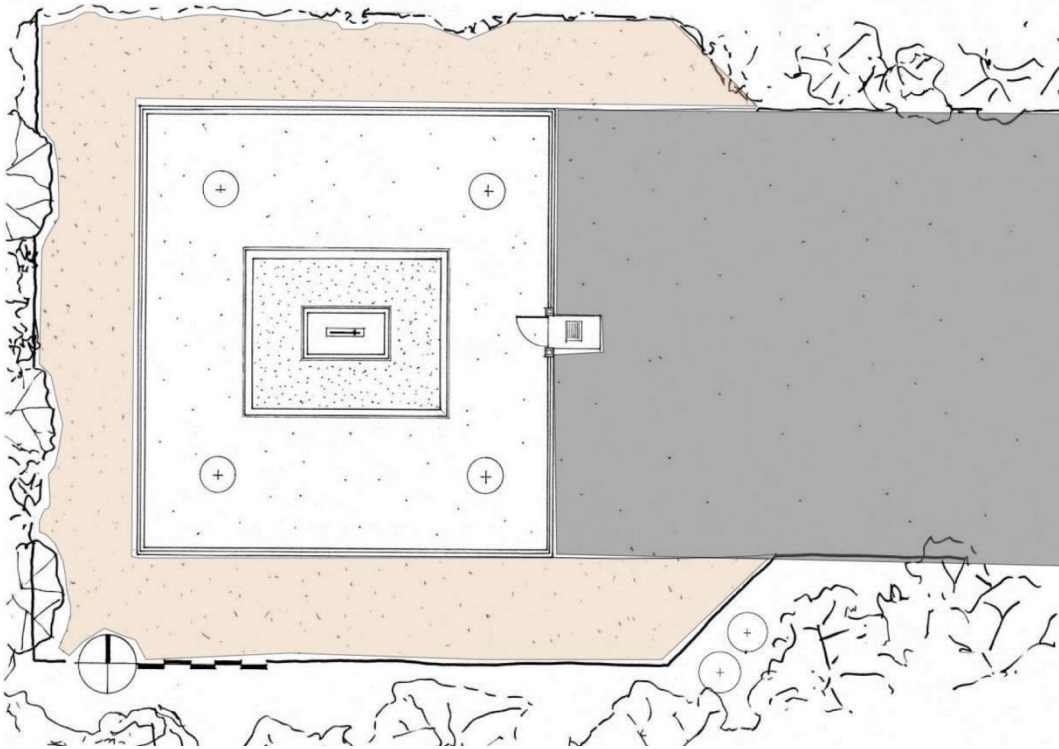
Current Landscape —showing asphalt and dirt/gravel areas. Not to scale. (Source: GML on Pip Giovanelli Plan, 2011)
